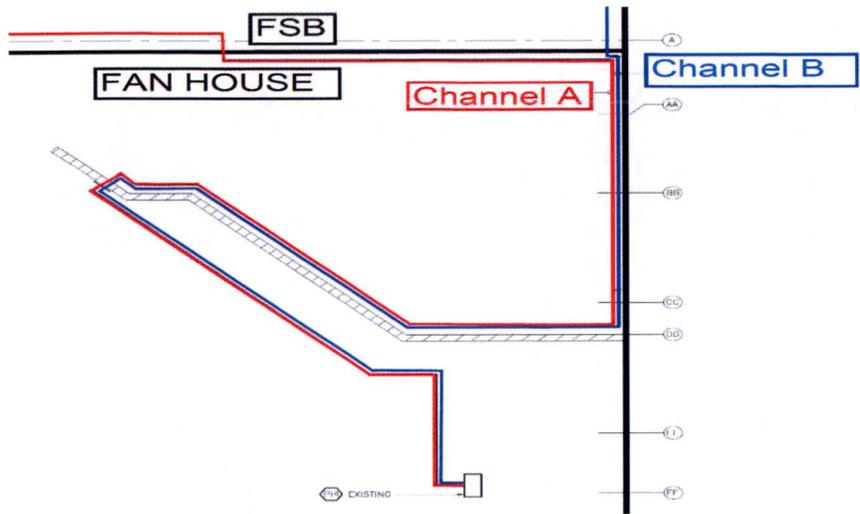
IP3 SFPI Fan House Cable Routing Sketch (not to scale)
